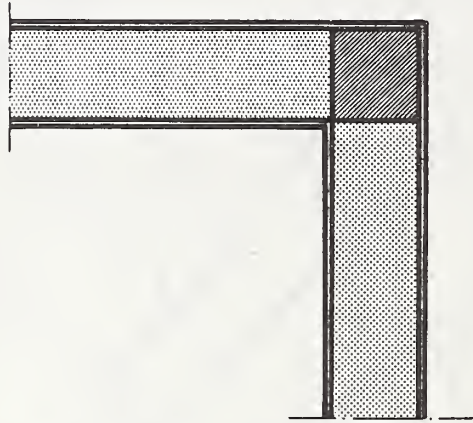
Corner of two exterior walls incorporating a post case of light masonry
